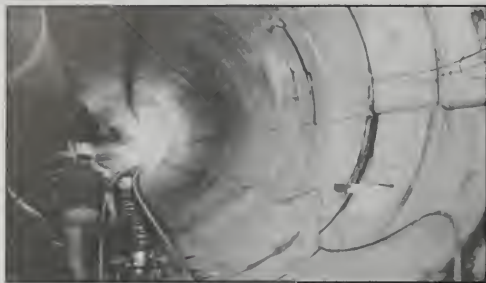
Expanded precast concrete segment initial supports for tunnel. Four 4-foot-wide segments were assembled to construct each ring.
